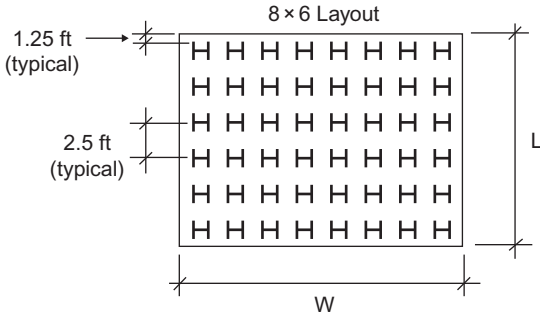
Layout of an 8 × 6 pattern of piles.
